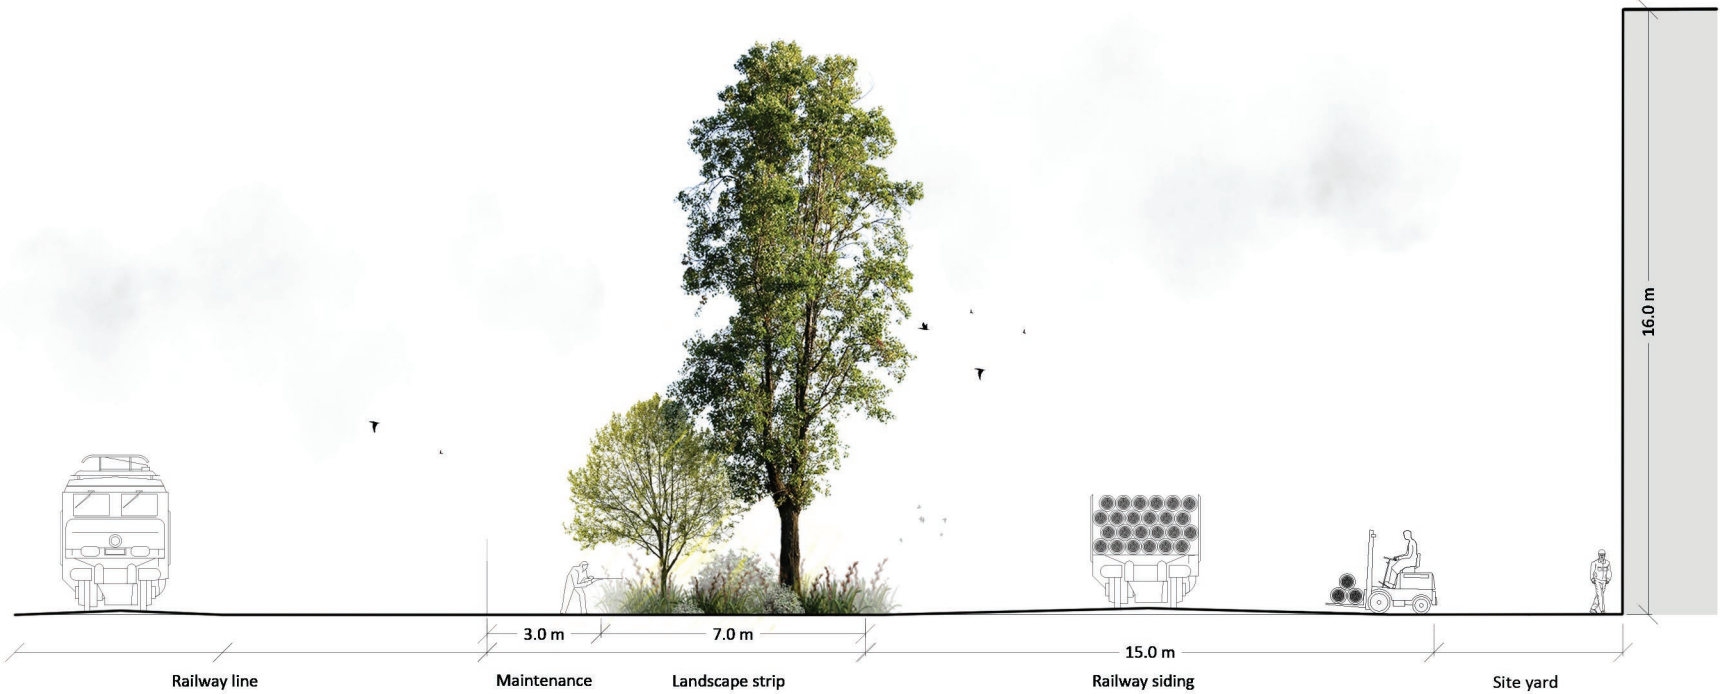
10m Western Boundary for 16 metre height area up to Limeworks Road (and excluding Pan Pac site legally described as Section 1 SO 465421 and Lot 2 DP 23974)
